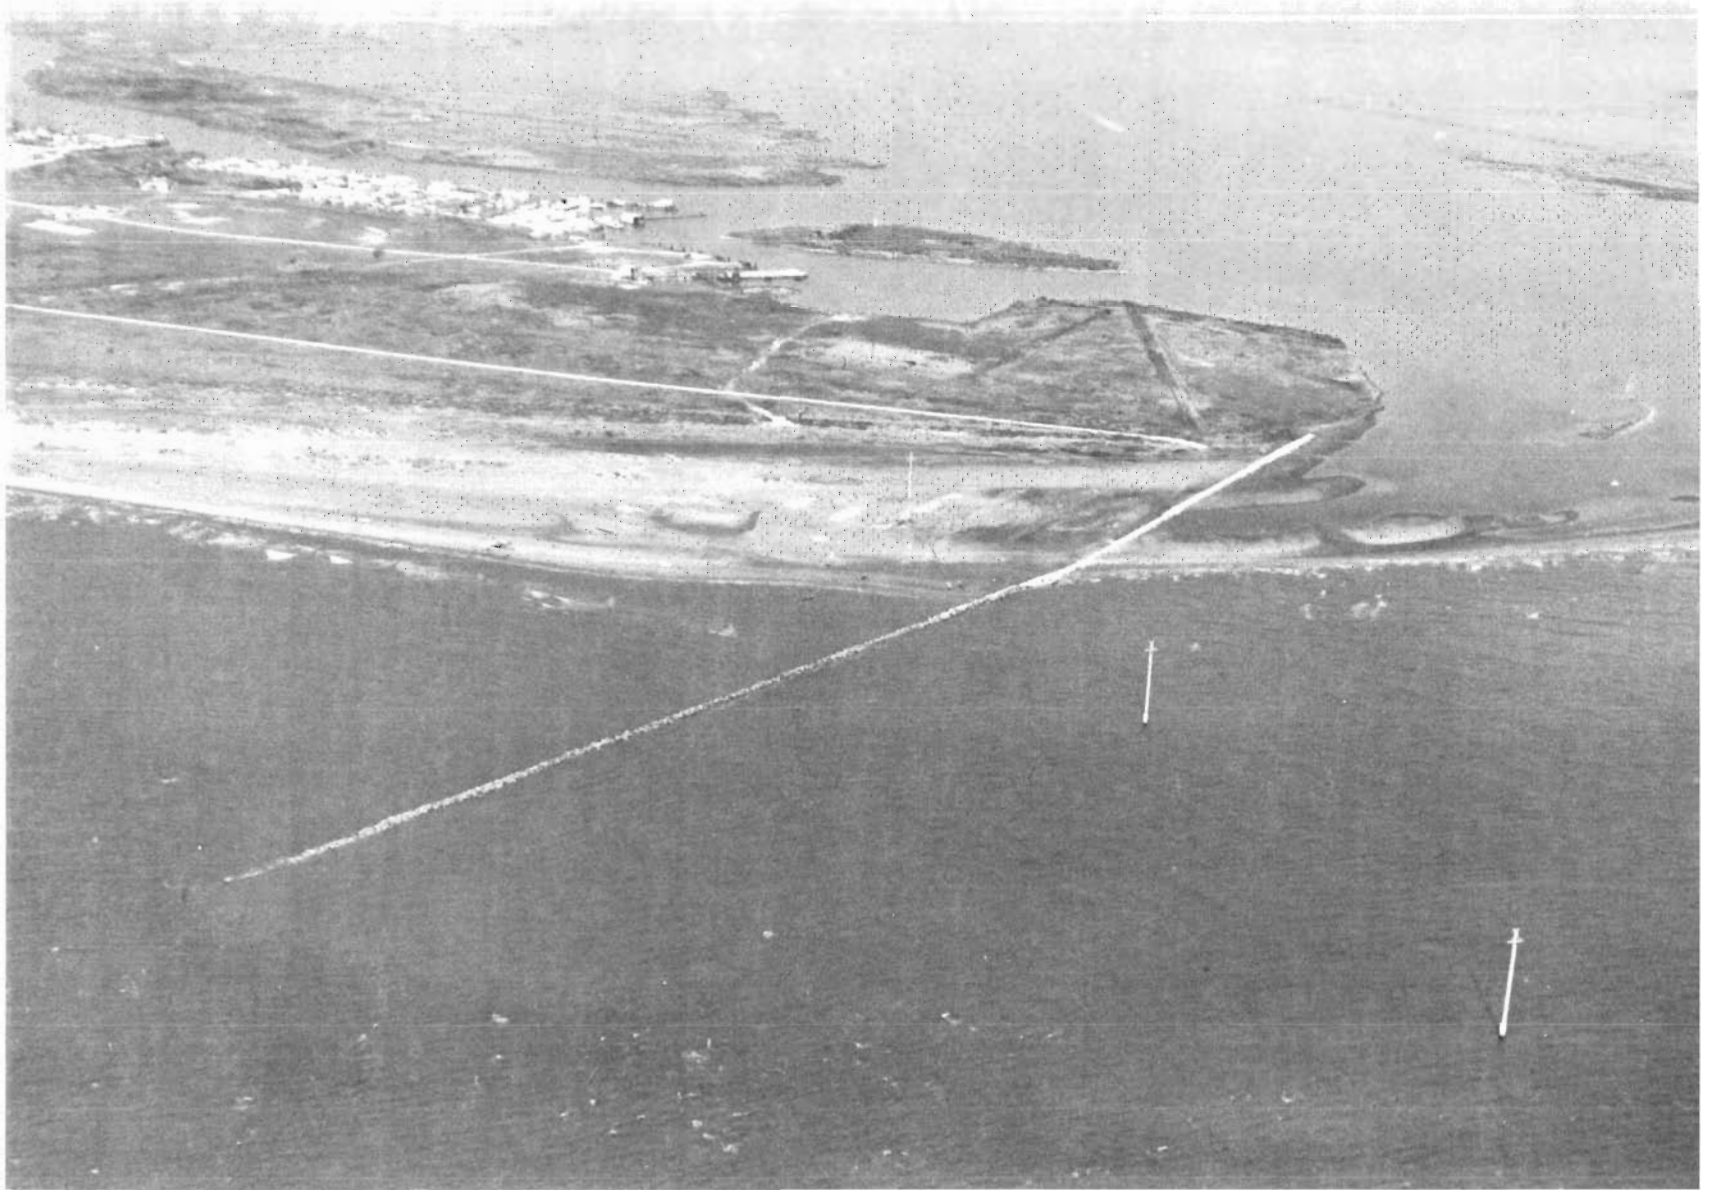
Accretion on Southwest side of newly constructed jetty on East End of Grand Isle
